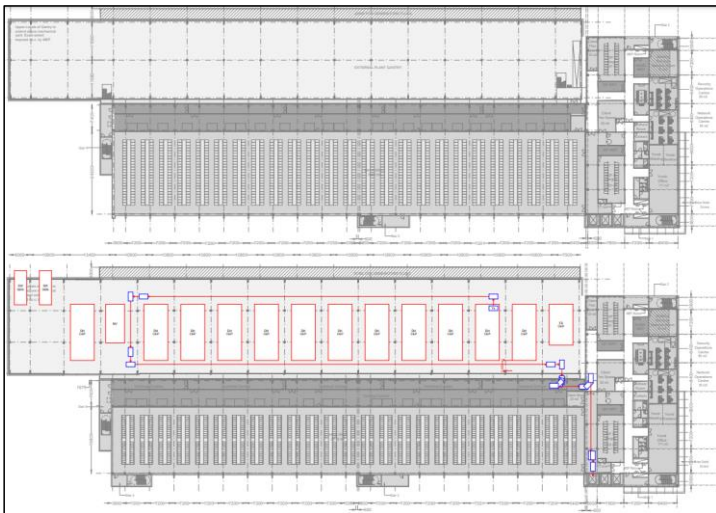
Second Floor Gantry Layout (CEP Layout) – Buildings A & B
